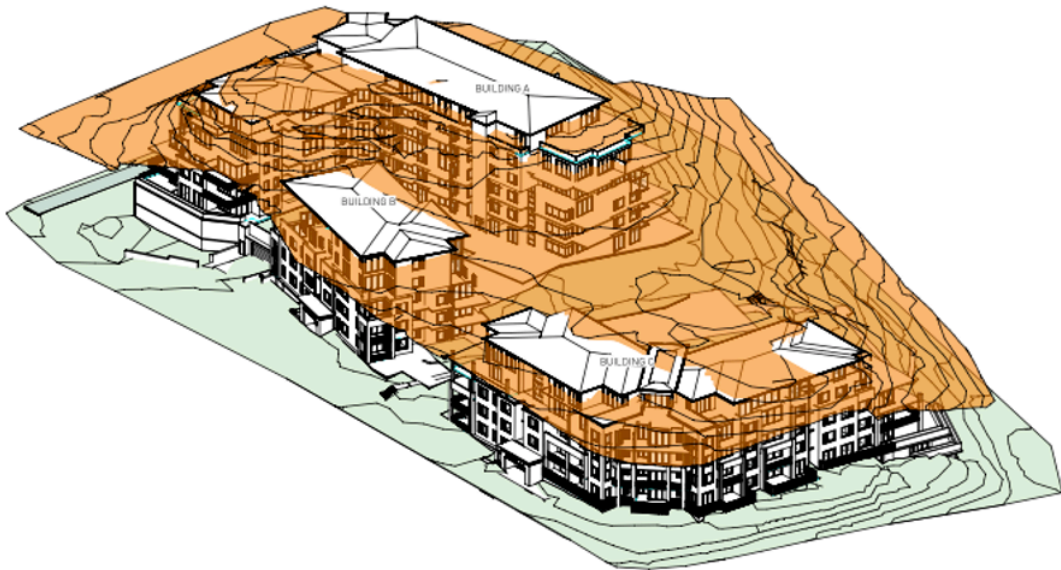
13m Height Plane Diagram - South West Elevation (extract from A 3.07 Rev E)
